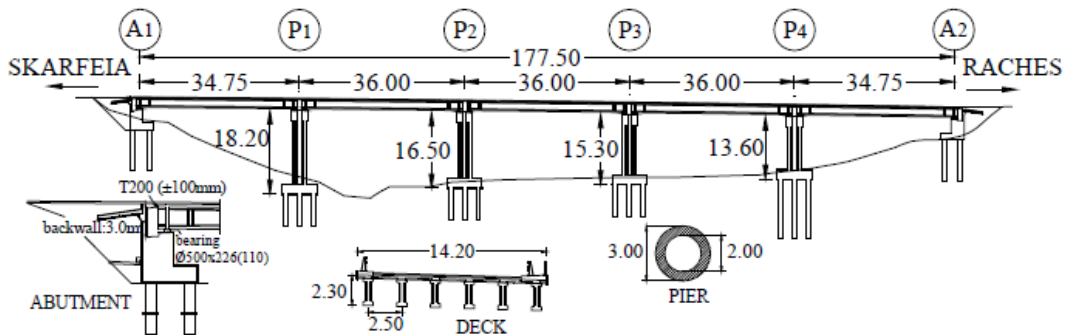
Longitudinal section of Scarfeia-Raches bridge and the cross sections of the abutment, the deck at the mid-span and the pier.
